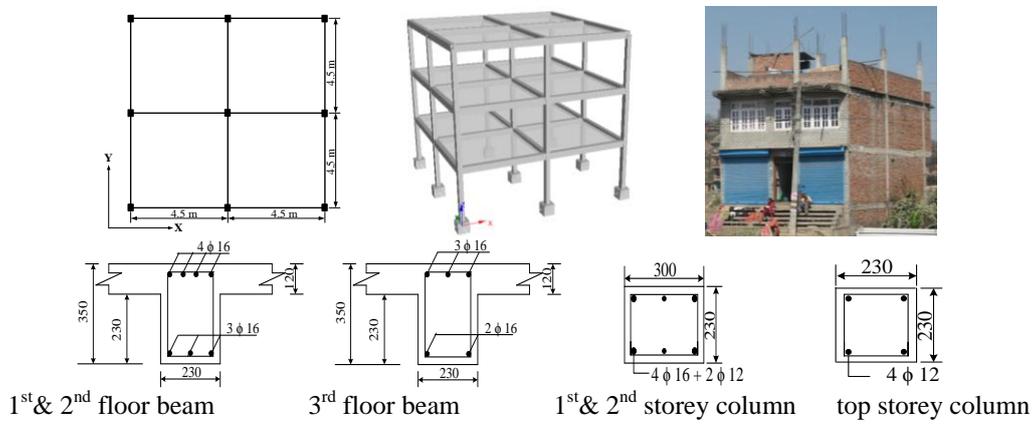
Plan, tridimensional model, and cross-section detailing of building model RC1
